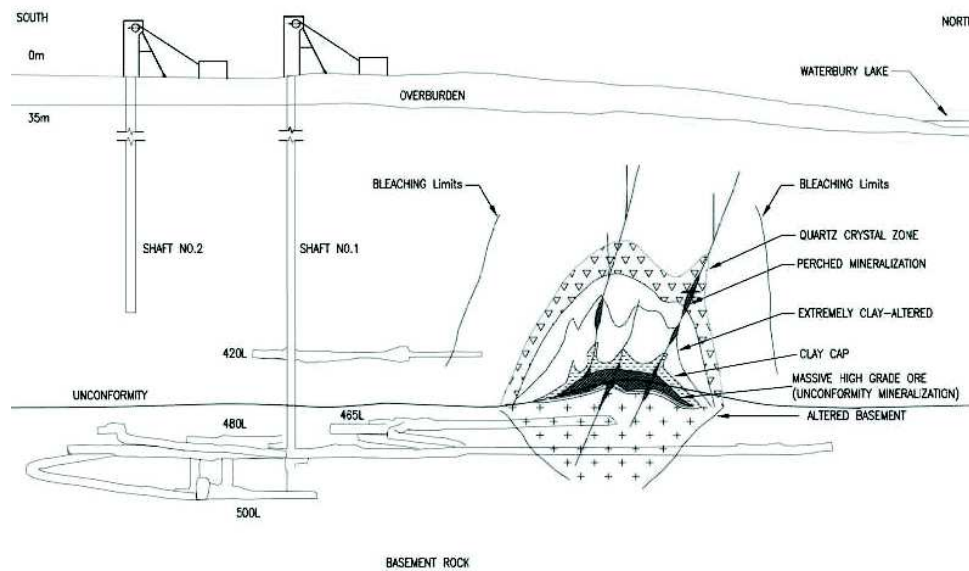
schematic geological cross-section of the Cigar Lake orebody and existing underground development
